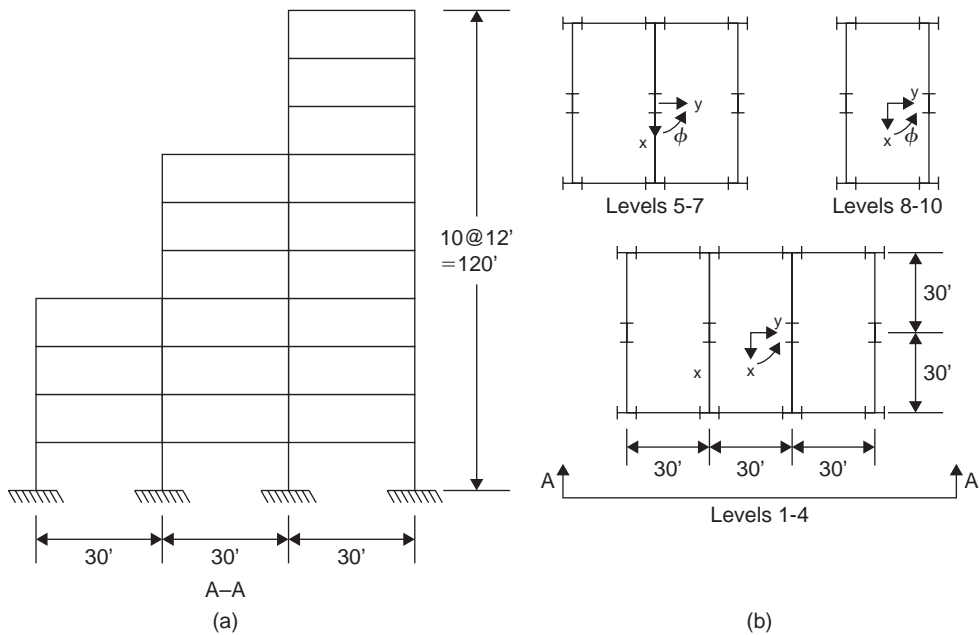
Example 11 – 10 story setback building (a) Elevation, (b) floor plan.
